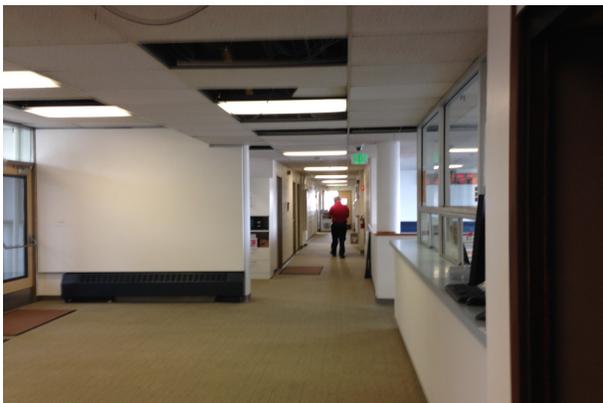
Entrance lobby of Building 158, looking north down the central corridor. Existing unisex restroom first door on the left (center). Source: Page & Turnbull, 2017.
